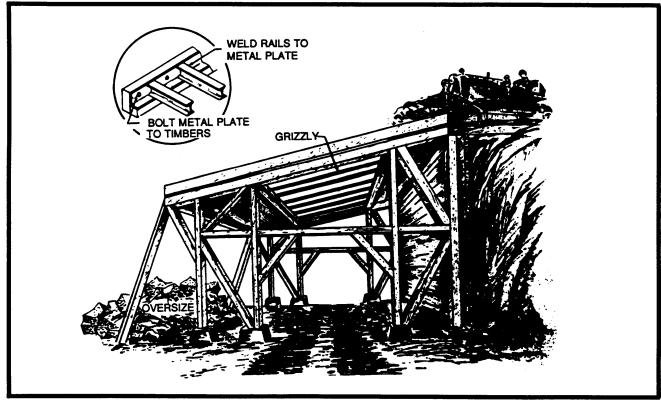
Single-End Trap and Grizzly Loading Ramp
